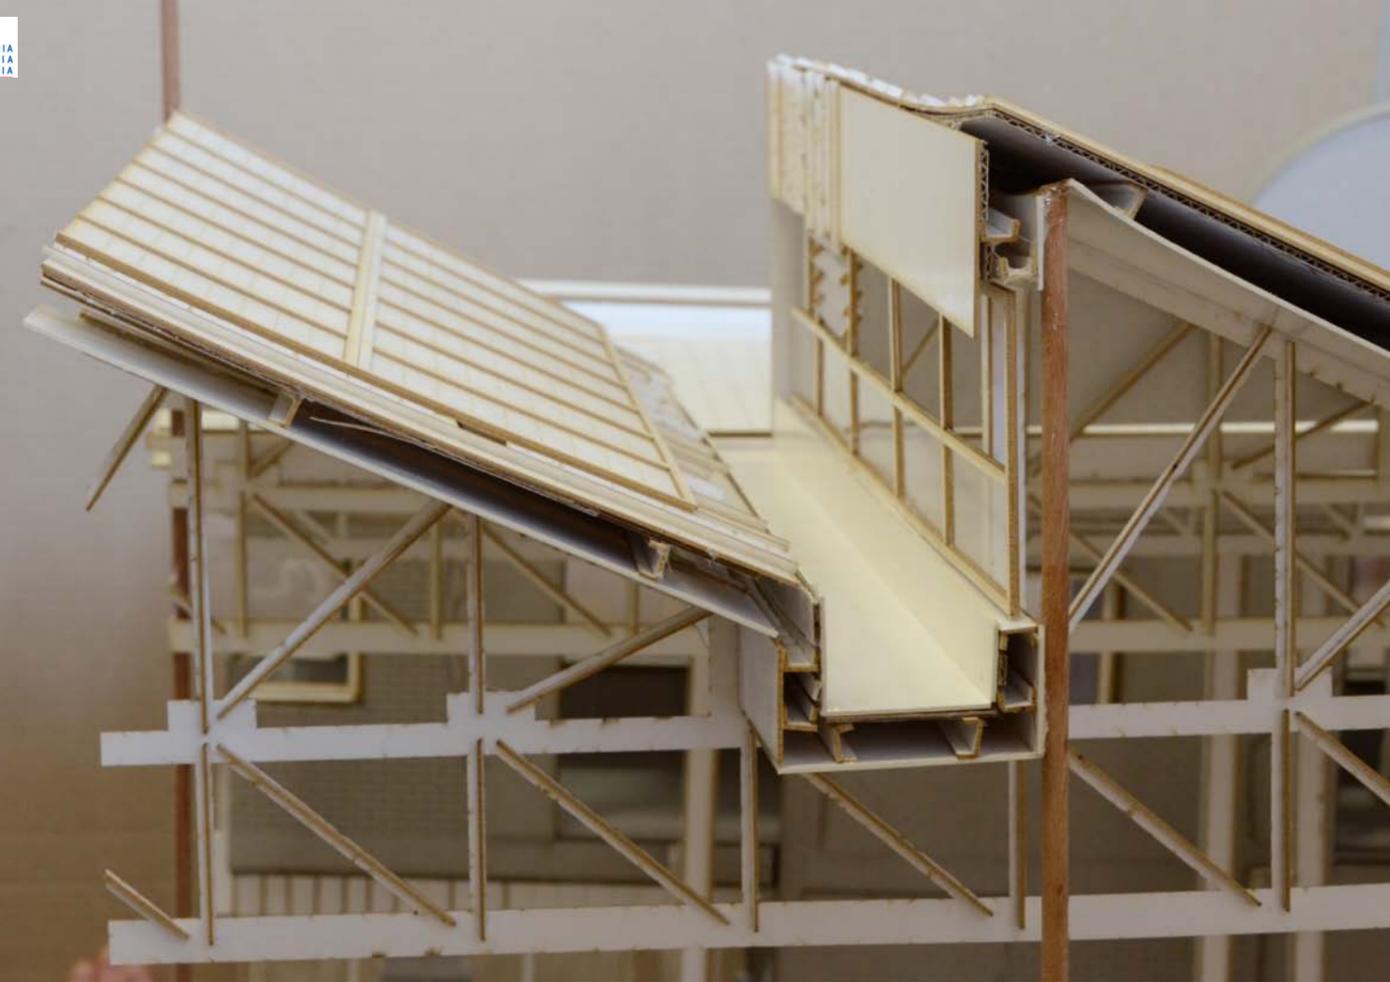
Model 2: sawtooth truss, box gutter and skylight detail (Author November 2013)
